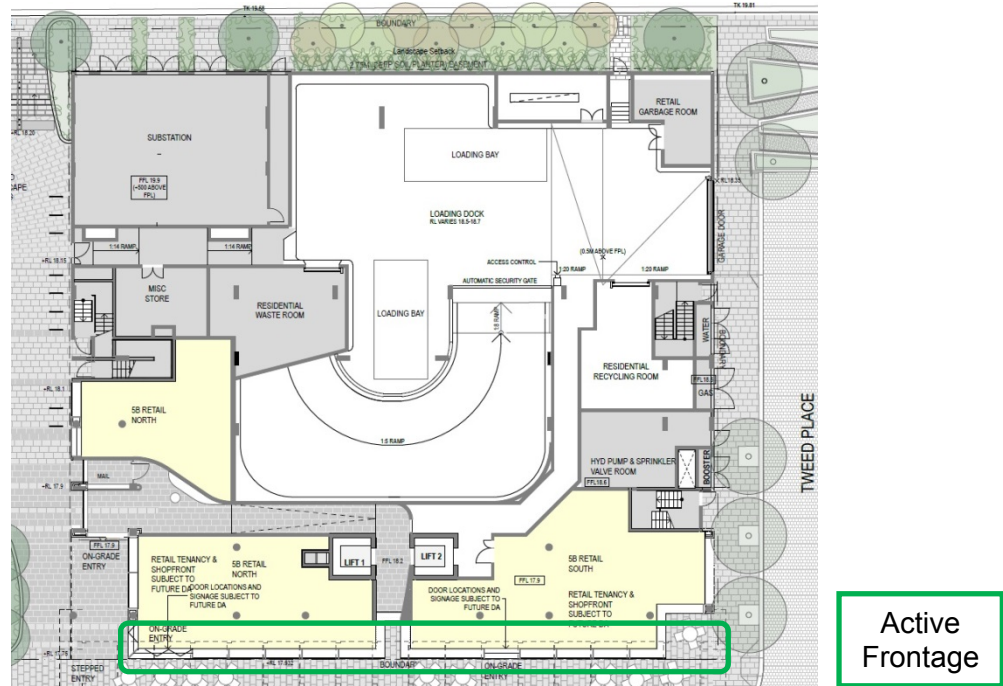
Building 5B – Proposed ground floor with single core design. No inactive frontage along Portman Street. Pedestrian access has been moved to the through-site link.
